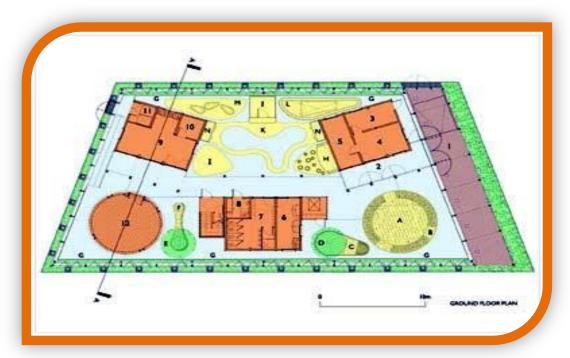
Ground Floor Plan of Fawood Children Centre | Source: Roderick Coyne/Alsop & Partners(2016)
